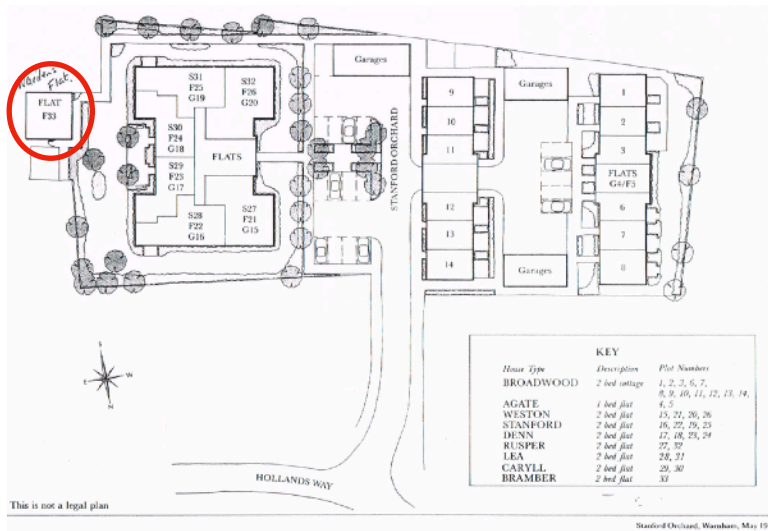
Stanford Orchard Layout Plan (Note reversed north orient.)
